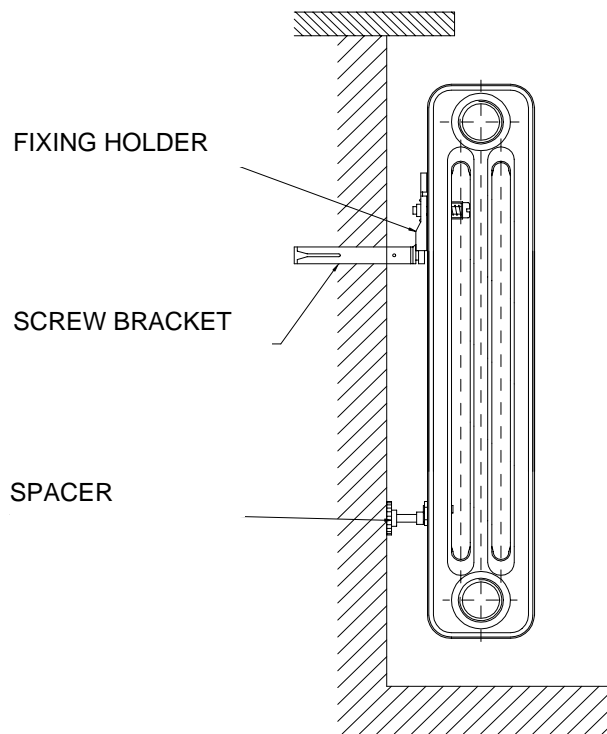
Fixation of heating bodies into hollow walls using screw brackets
